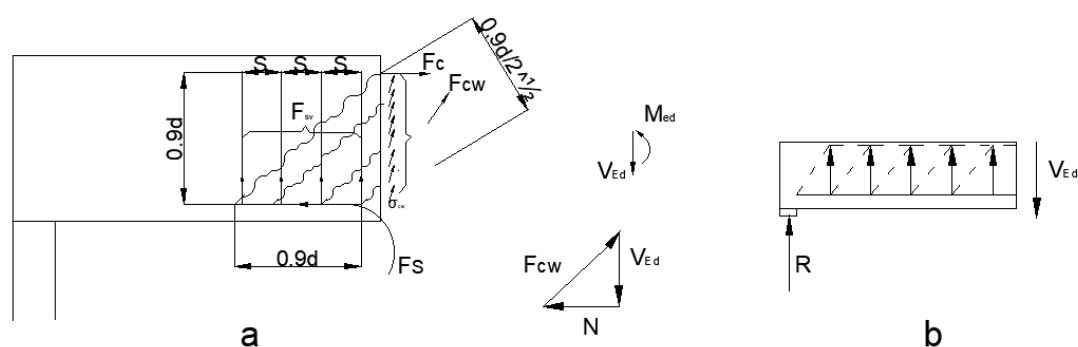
Equilibrium of a concrete member with shear reinforcement and inclined cracks a) equilibrium conditions b) Truss model with inclined struts and vertical ties. Based on Engström (2011b).
